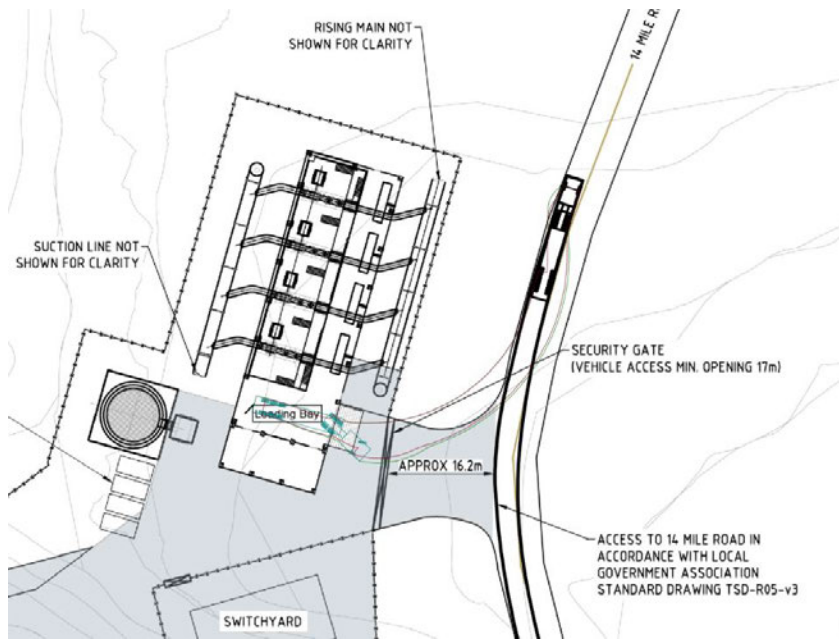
No. 2 Pump Station Site swept path - 19m semi-trailer into loading bay
